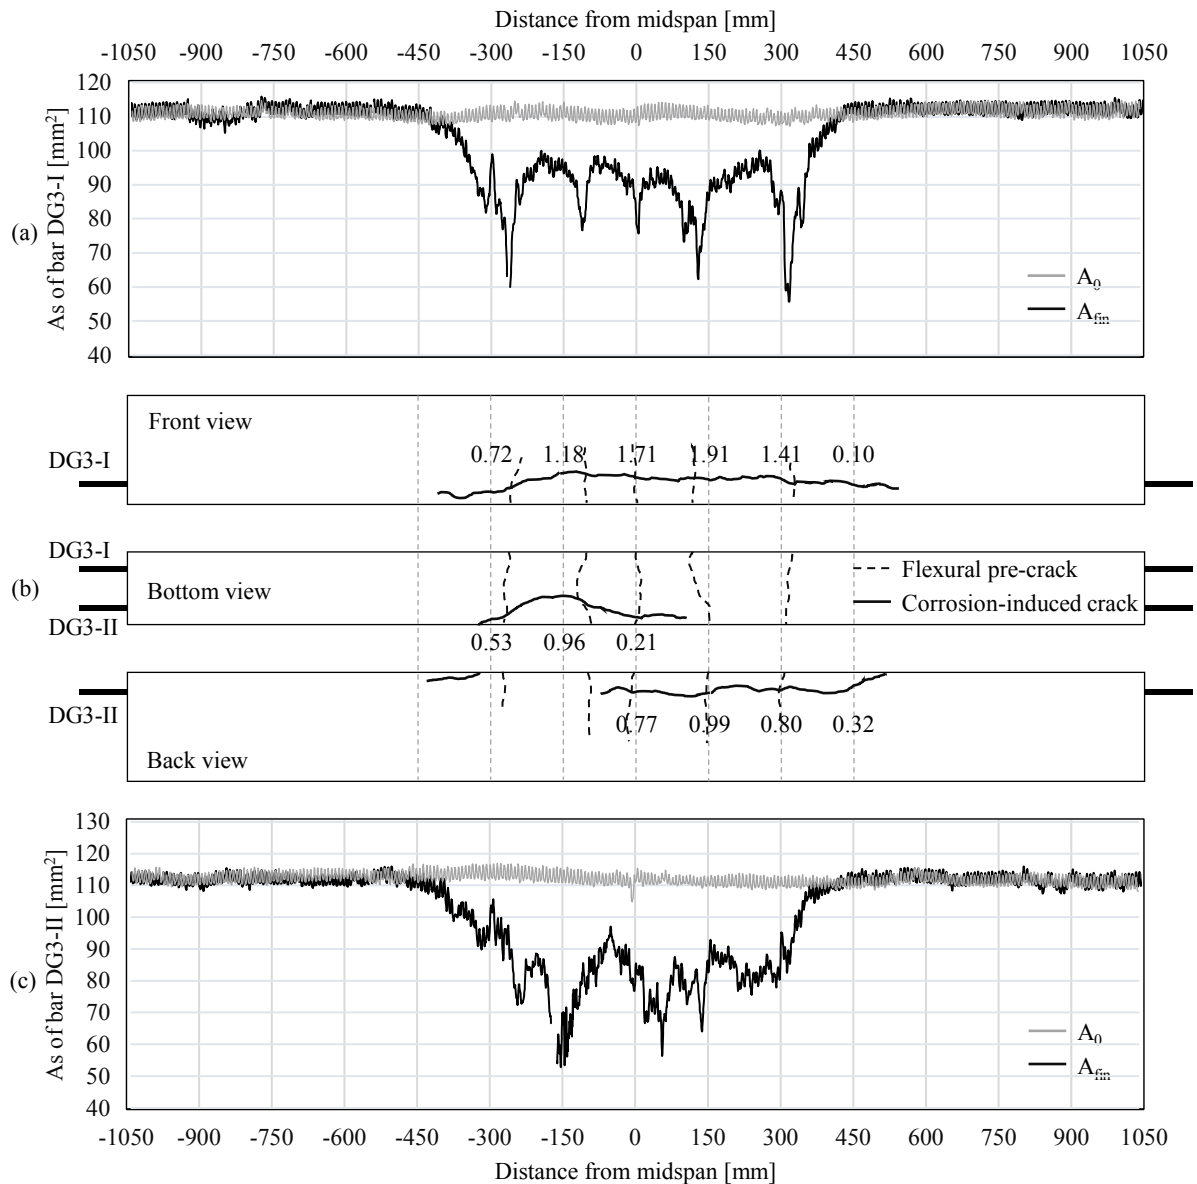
(a, c) Cross-sectional areas of the tensile reinforcement bars I and II in specimen DG3; (b) flexural pre-cracks and corrosion induced cracks, of which the widths (unit in mm) were measured every 150 mm;  $A_s$ —cross-sectional area;  $A_0$ —cross-sectional area of steel bars measured in the initial state before casting beams;  $A_{fin}$ —cross-sectional area of steel bars measured in the final state after taken out from the tested specimens.
